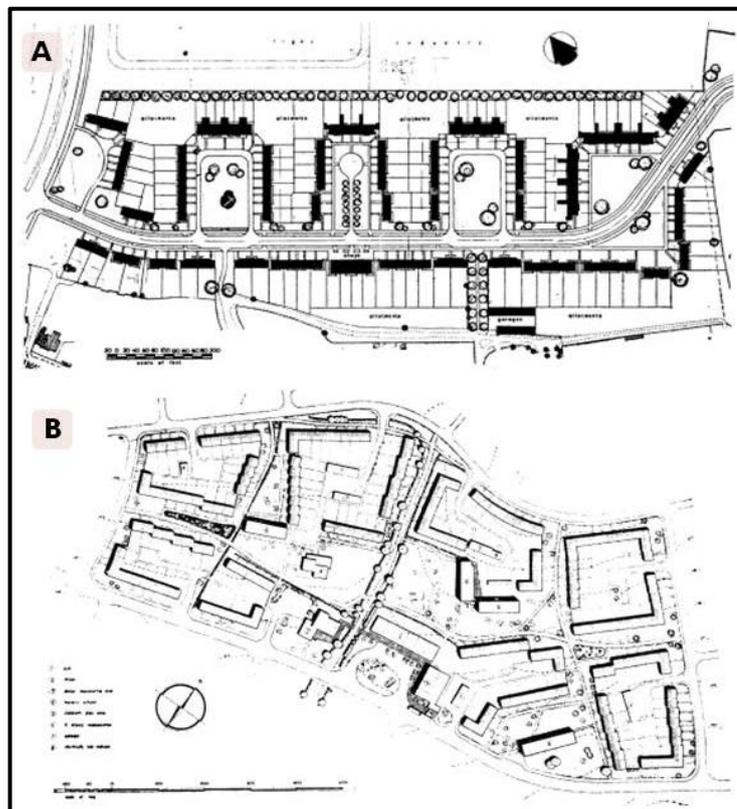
A: Plan of Dallington Fields, Northampton; Layout Plan Showing Conventional Cul-de-Sac Treatment Discussions on which Gave Rise to the Radburn Experiment at Eastfield B: Plan of Greenhill, Sheffield; Radburn Type Superblock(Womersley, 1954, pp. 183, 193)
